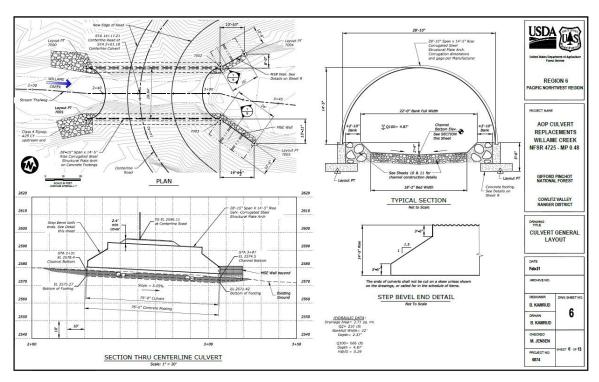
Design example of a typical open-bottomed arch structure with pre-cast concrete footings to provide AOP at all flows and life stages.
